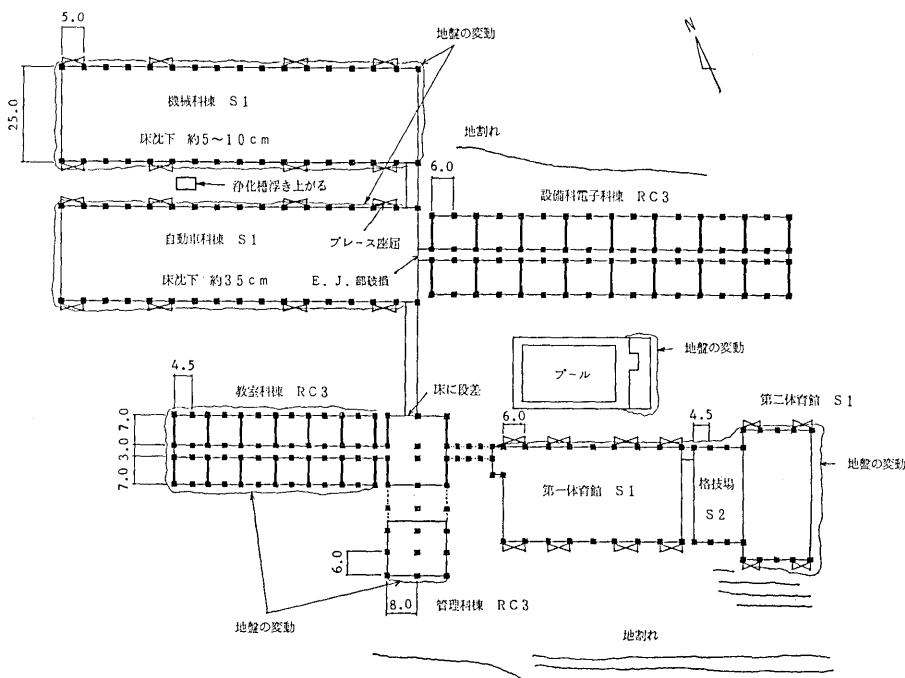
Plan and details of damage to the buildings of Oga Kogyo High School (Funakoshi, Oga city).
